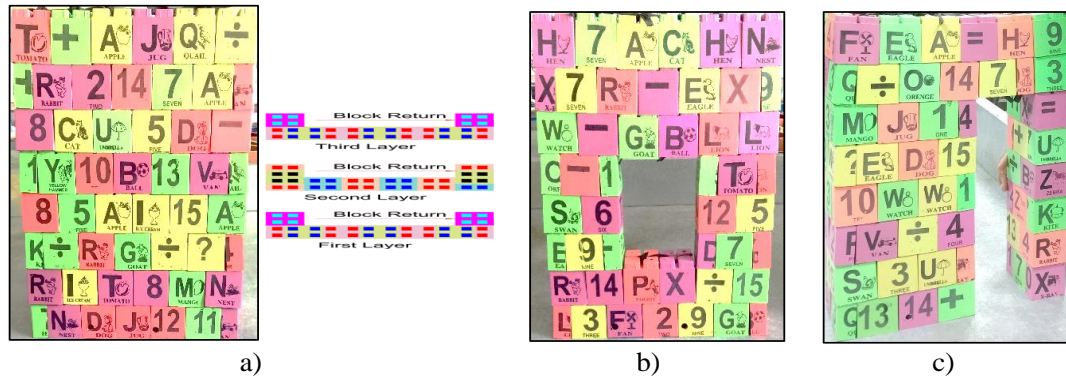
Schematic Diagram of Prototype Walls with Block-return with Simplified Boundary Conditions; a) Elevation of Solid Wall and Typical First Three Layers in Plan, b) Elevation of Wall with Window Opening, c) Elevation of Wall with Door Opening.
